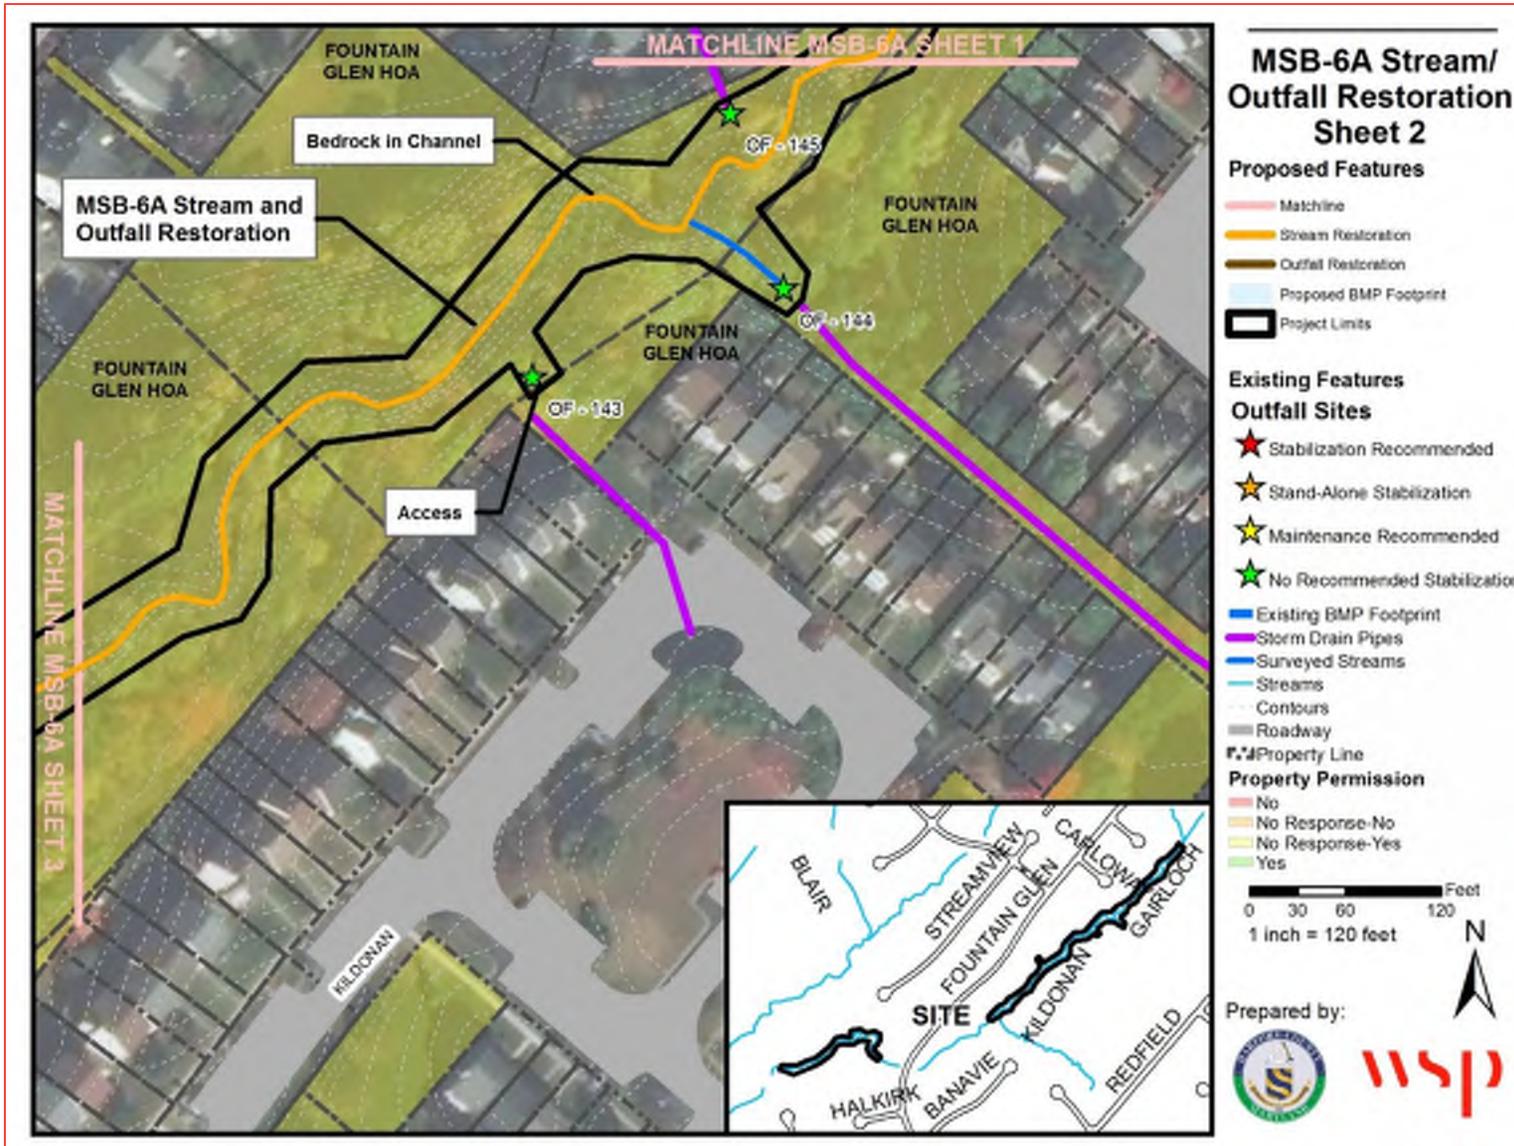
Site Location and Proposed Project Plan for MSB-6A Stream Restoration (Sheet 2 of 4)
